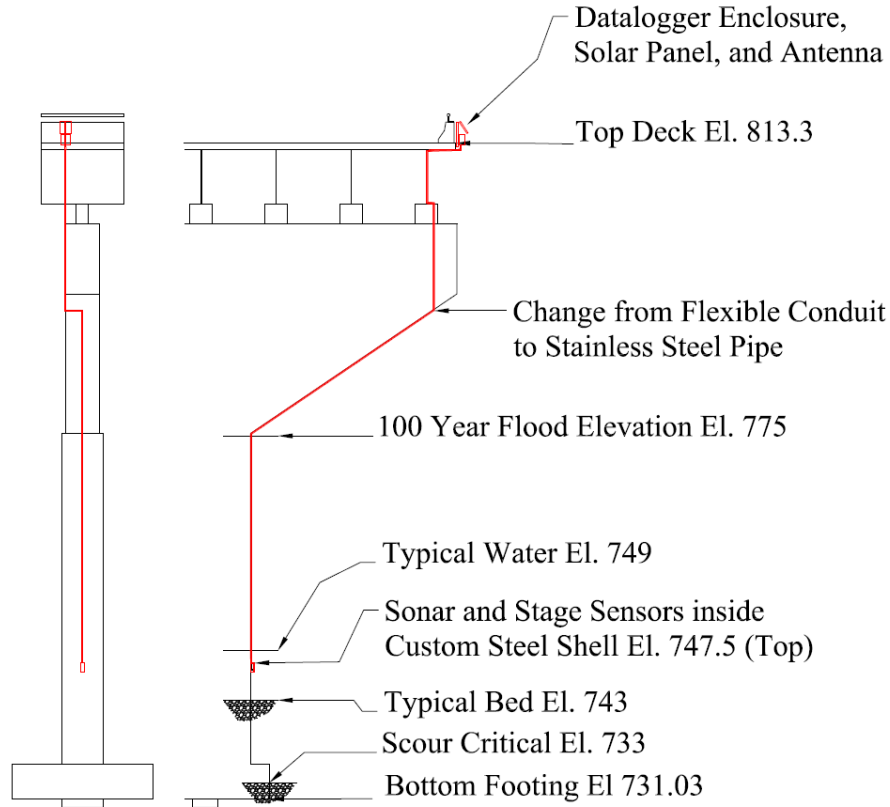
Bridge 07011 - pier 4 sonar installation
